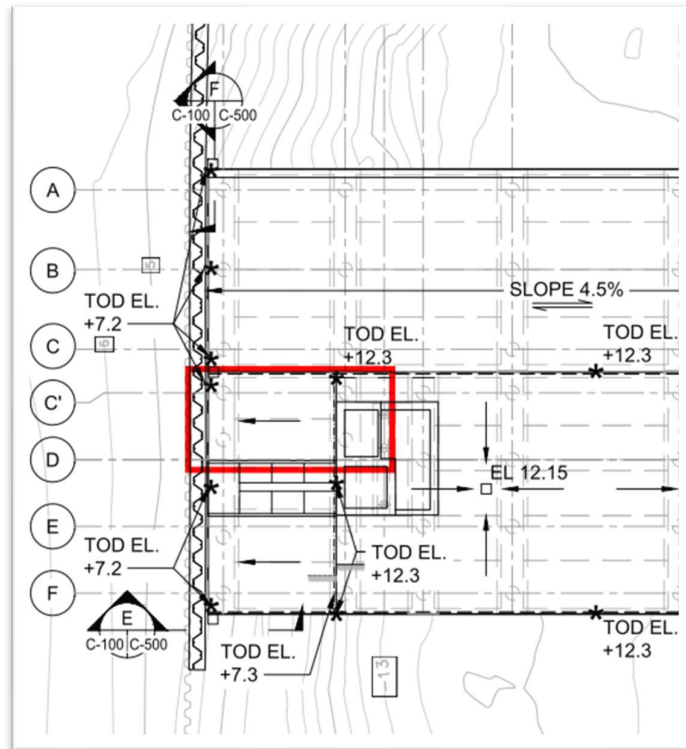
shows the plan of the layout of the slab mentioned in the section 4.3.1.3
